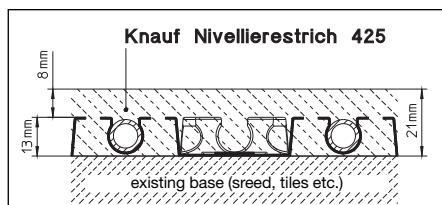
Knauf levelling coating 425 (minimum covering 8 mm, total structural height 21 mm)
